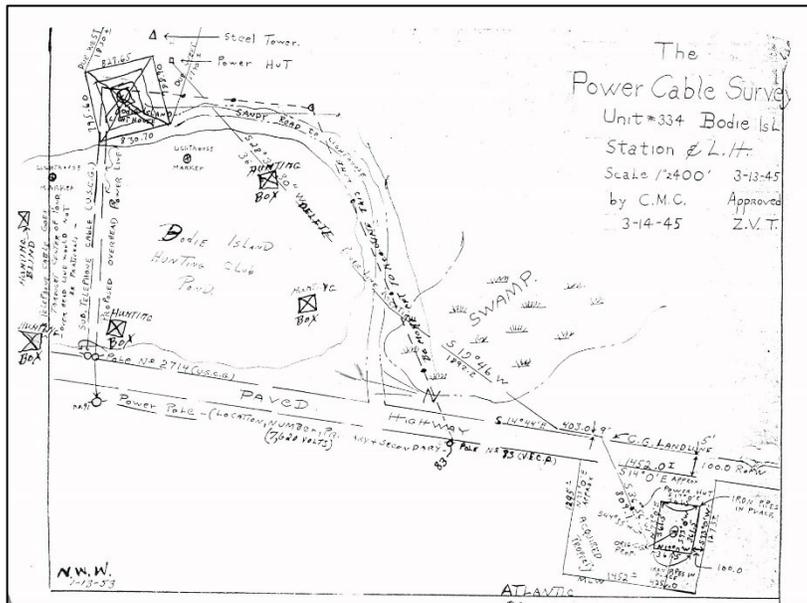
Power Cable Survey. Note road into the station. (Bodie Island Lighthouse HSR appendix)
